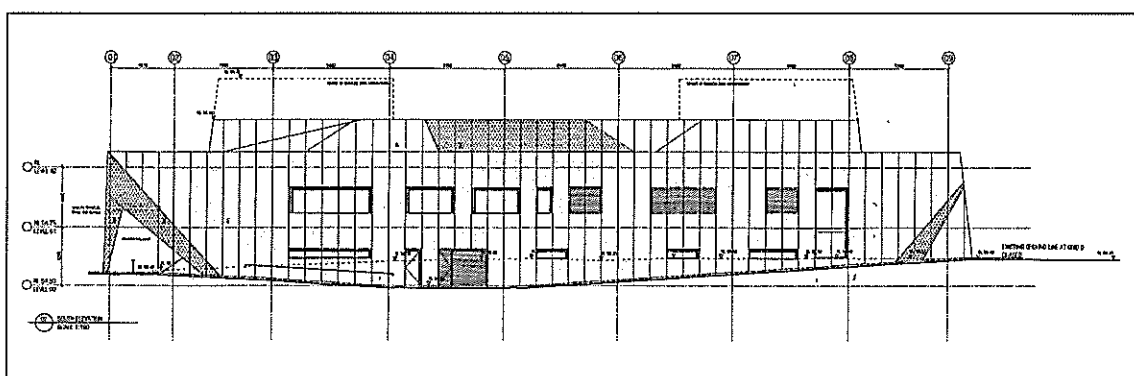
Proposed south elevation (fronting multi-storey carpark)
